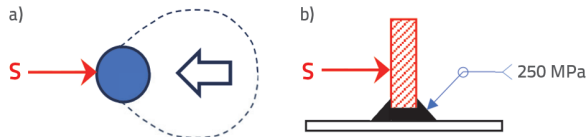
a) Plan view of the shear stud bearing onto the concrete under the shear force (S); b) Profile view of the shear stud welded onto the steel plate
